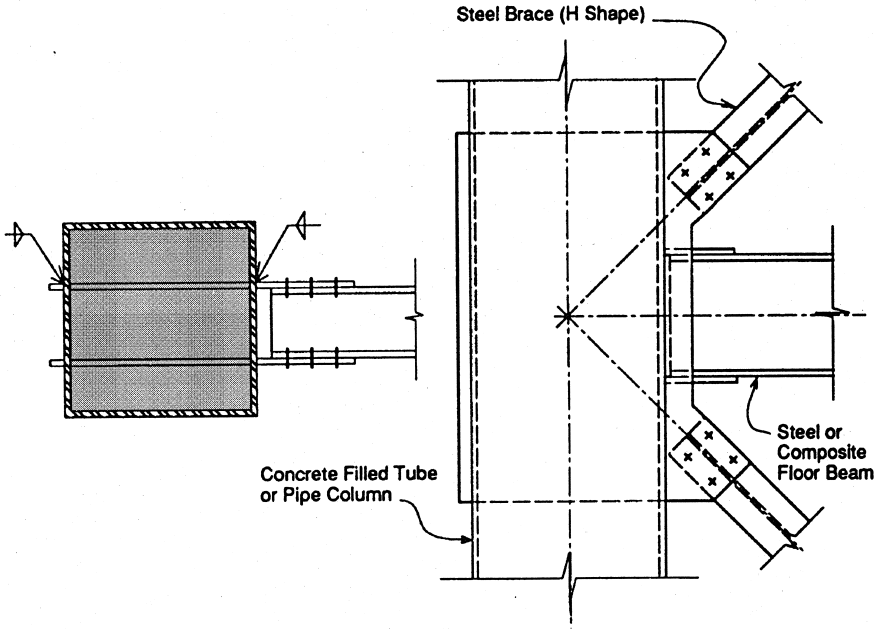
Filled tube or pipe column-to-steel concentric base.
